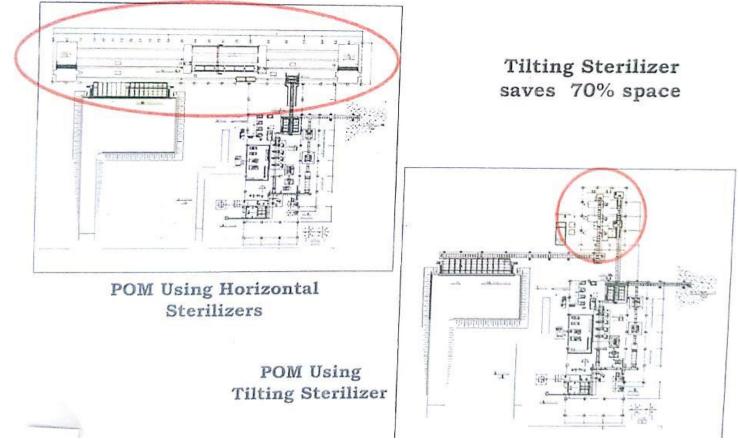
Technical drawings showing space saving (up to 70%) with Tilting Sterilizer
